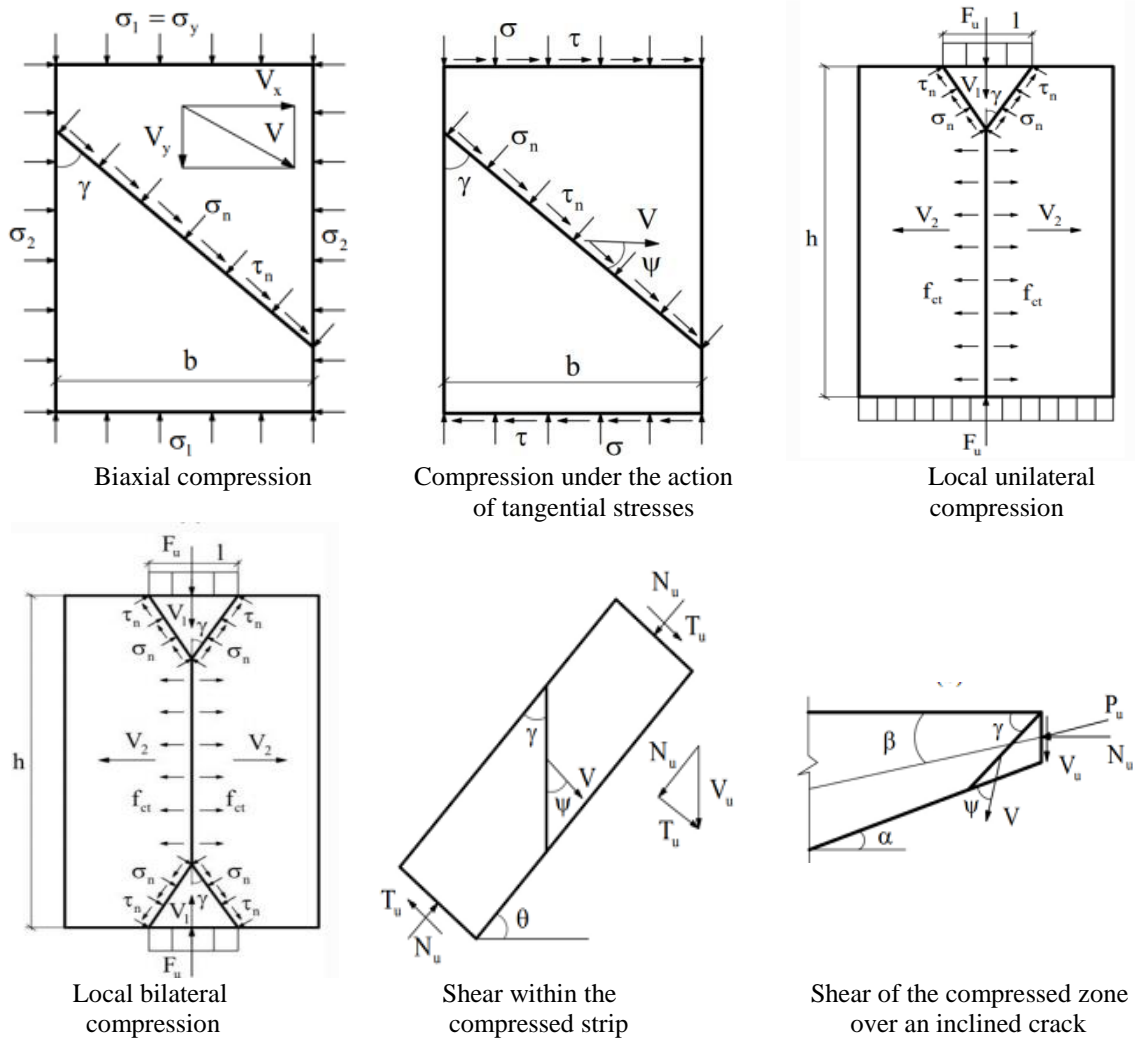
Kinematic failure schemes of concrete and masonry elements.
